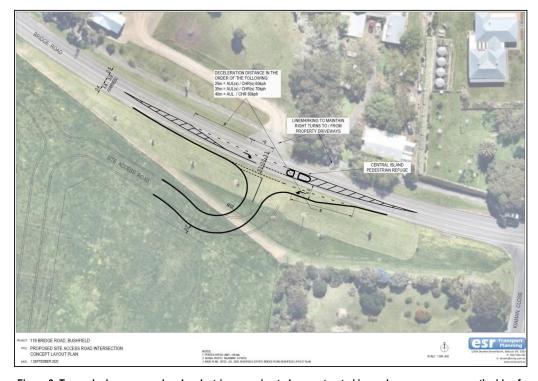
Tarmacked access road and pedestrian crossing to be constructed in road reserve area on south side of Bridge Road.
